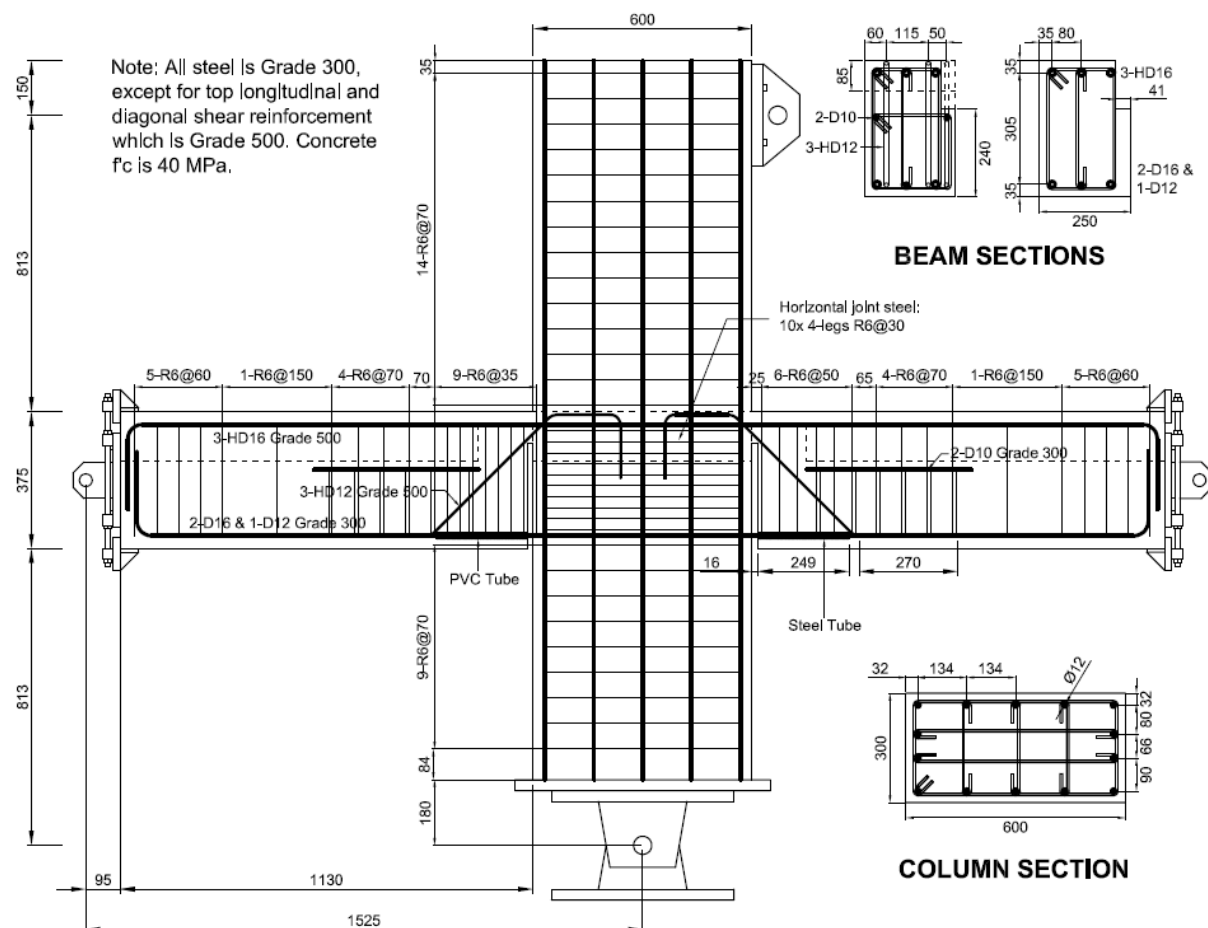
Specimen SB3 with floor slab – Front elevation of beam
